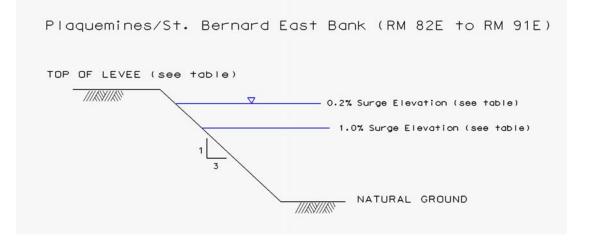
Typical Levee Design Cross-section (RM 82E- RM 91E) – Plaquemines/St. Bernard Parish East Bank
